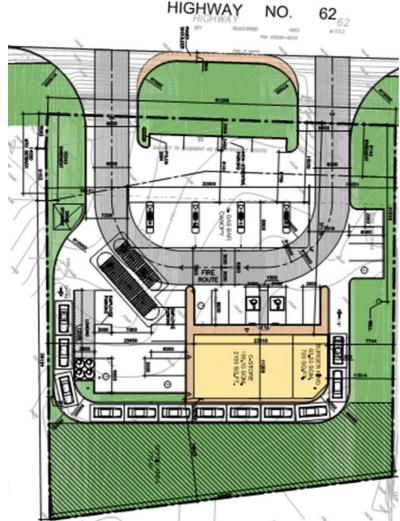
and 4 below show a Conceptual Site Plan for the development of the subject lands and provides site details. Two (2) access points to the site have been proposed, one along each street frontage. The vehicular circulation is proposed to be internal to the site.
